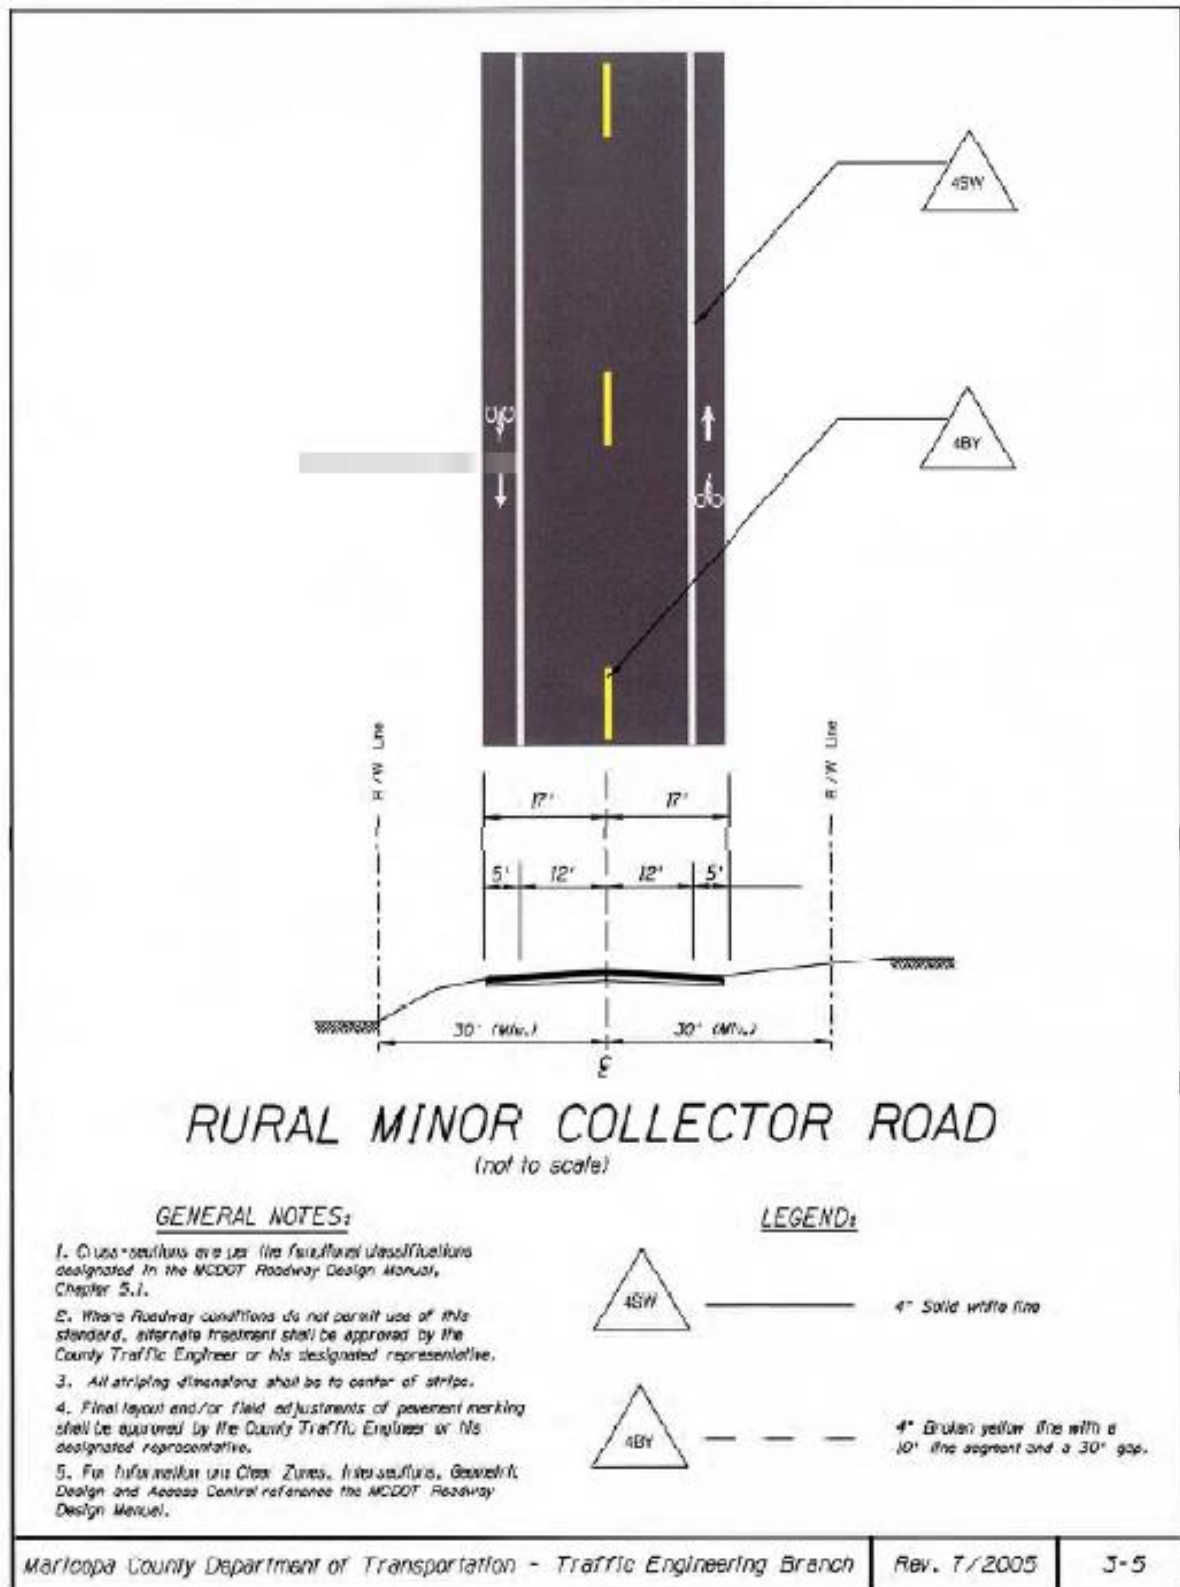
MCDOT Pavement Marking Manual's Typical Cross Section
